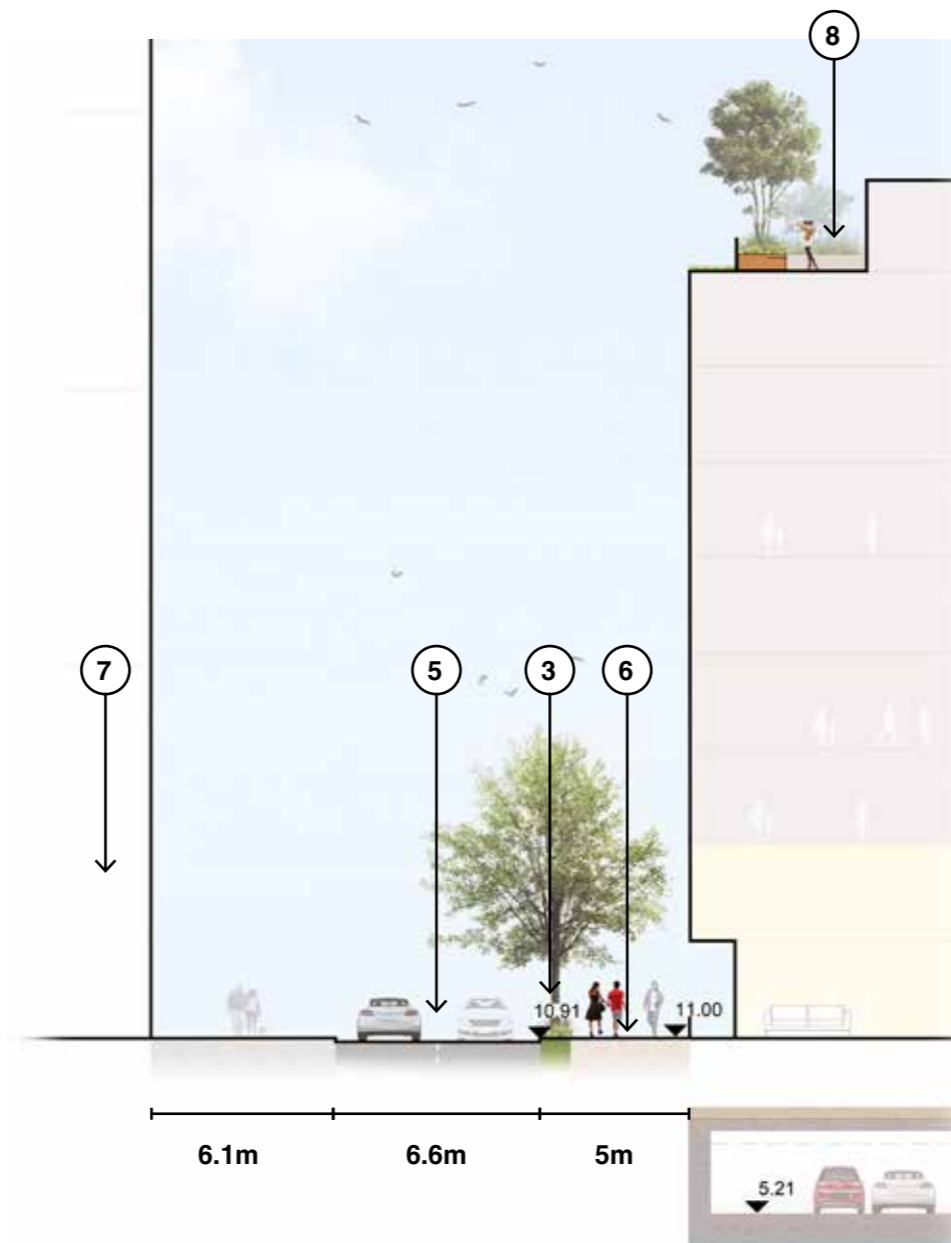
Section L - L looking North cutting through Horizon frontage
